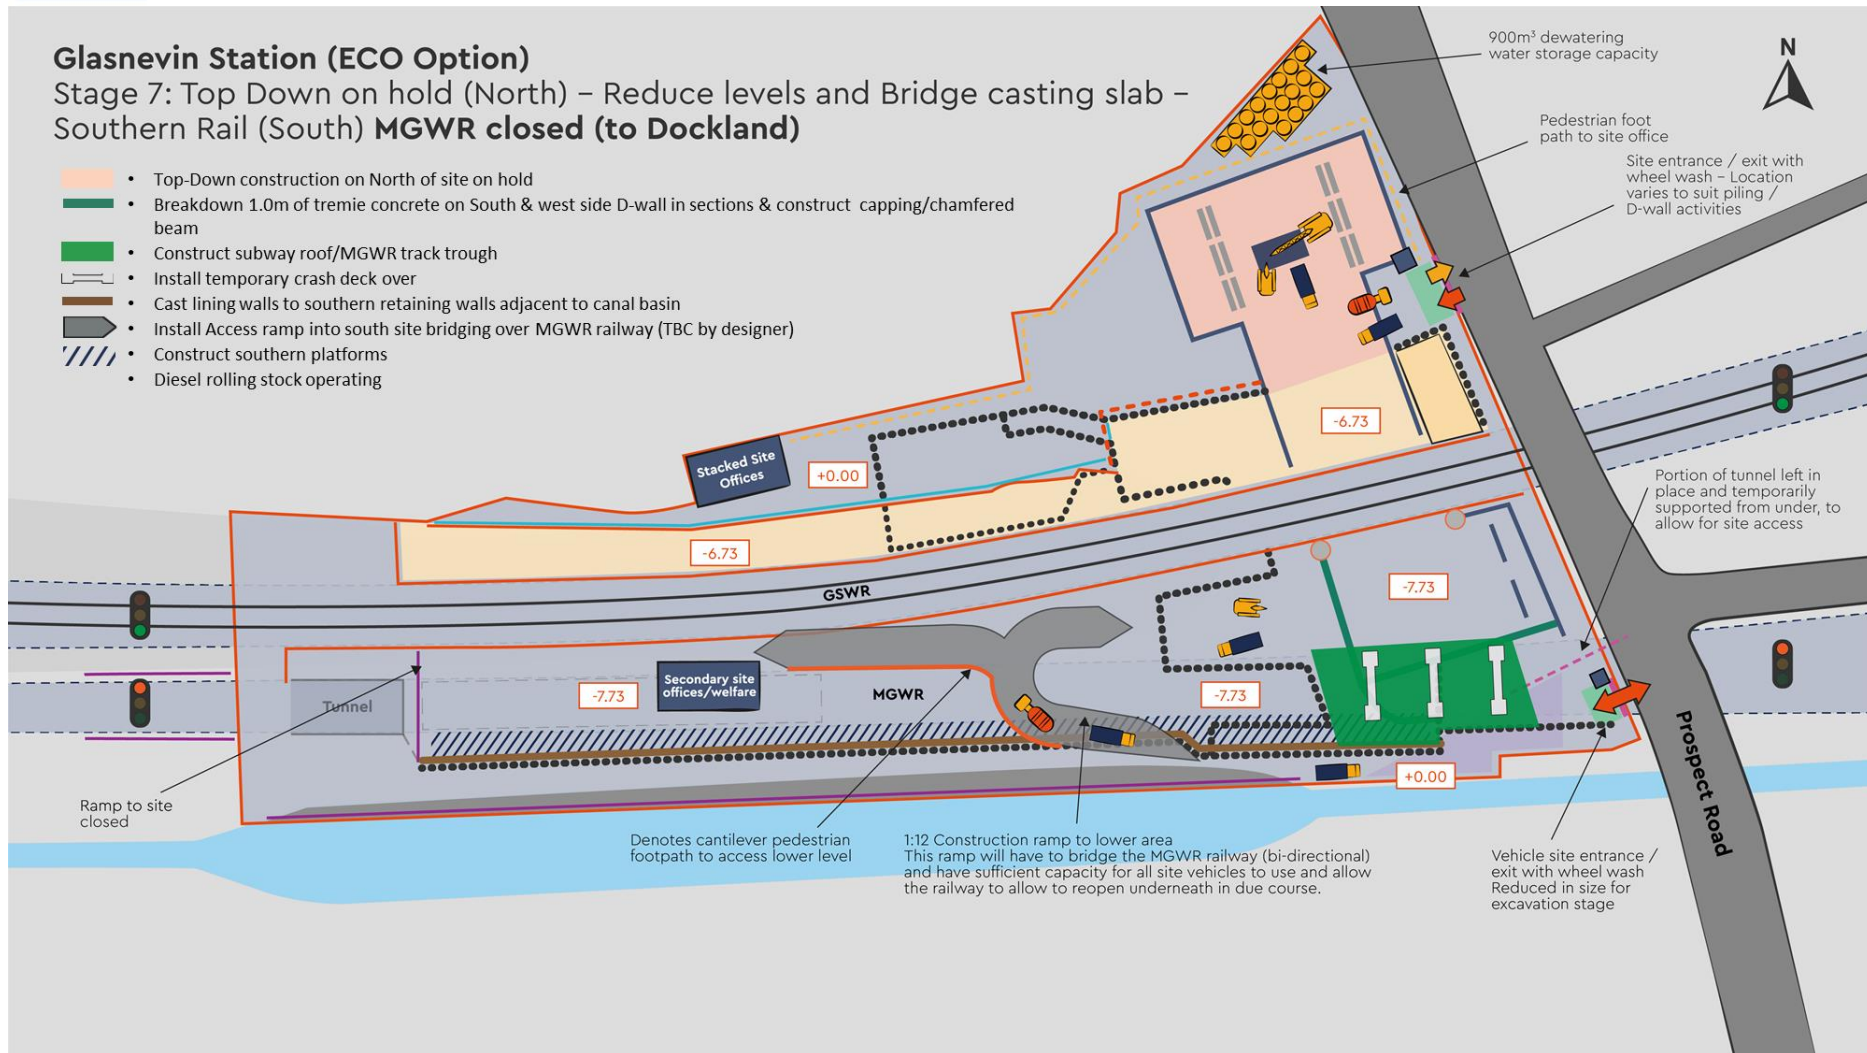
Glasnevin Station - Stage 7 Top Down on hold (North) Reduce Levels and Bridge Casting Slab
